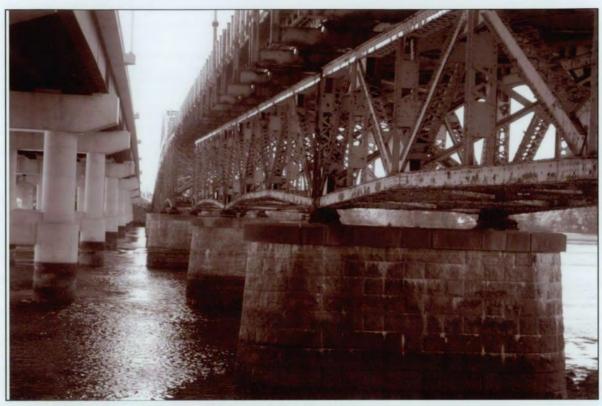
Description: GSB piers (right) and LBB piers (left) Reference (file name or frame#): DOV0158\_8
